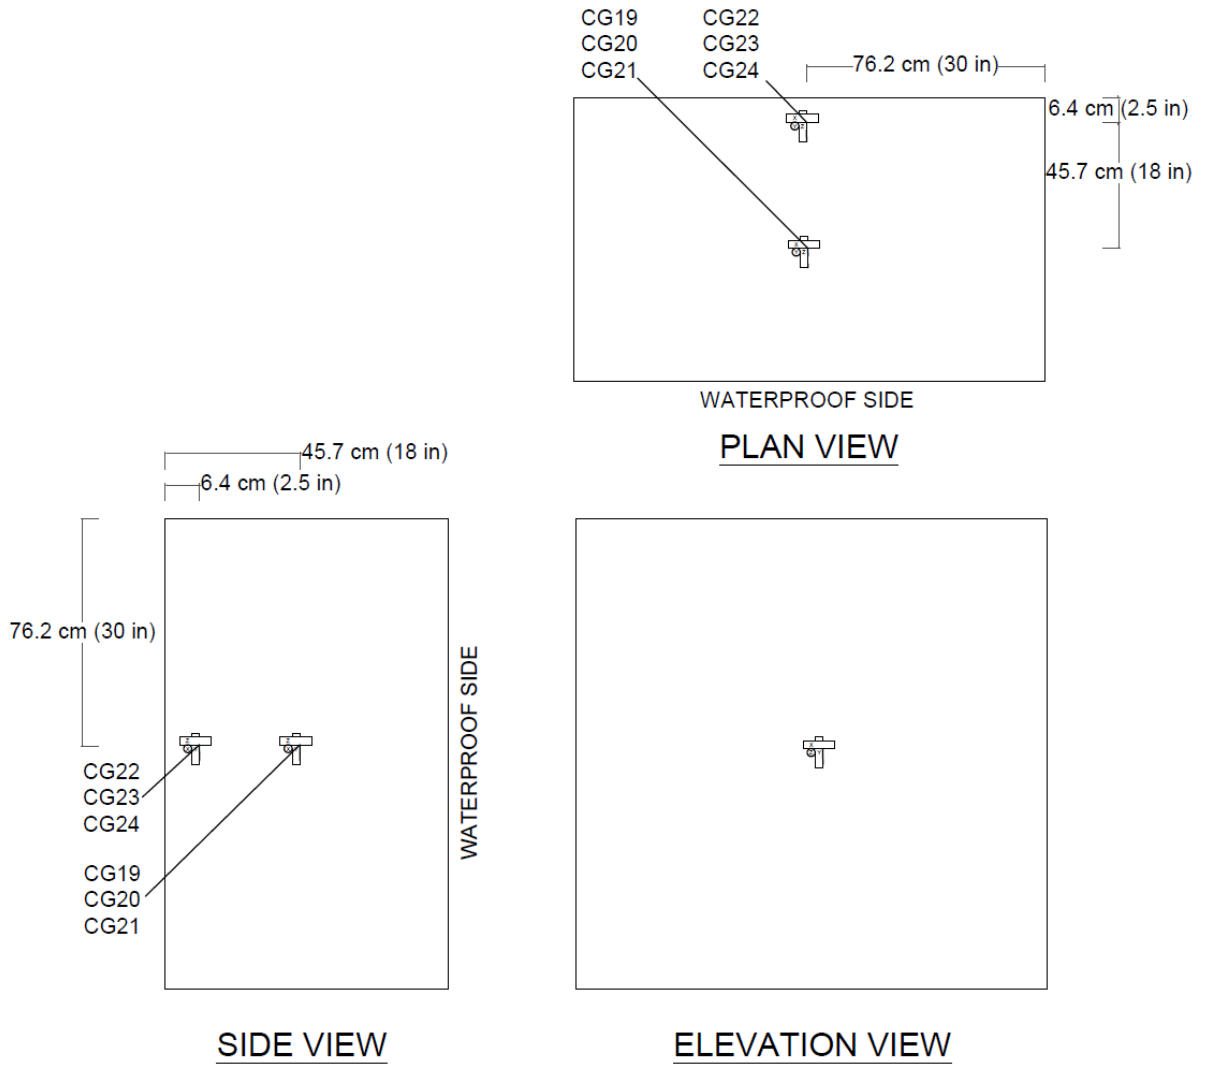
Specimen 3- Concrete Gage Labels and Locations
